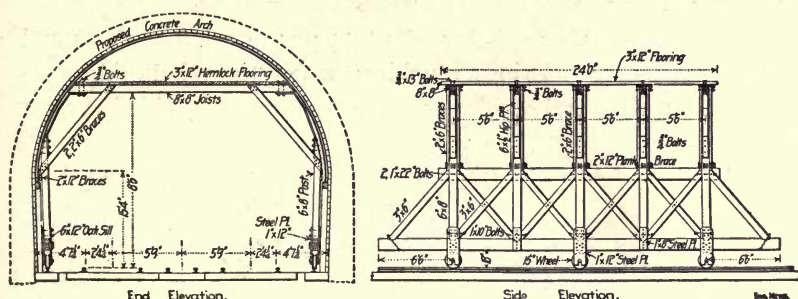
Musconetcong Tunnel: Traveling Arch-center.
